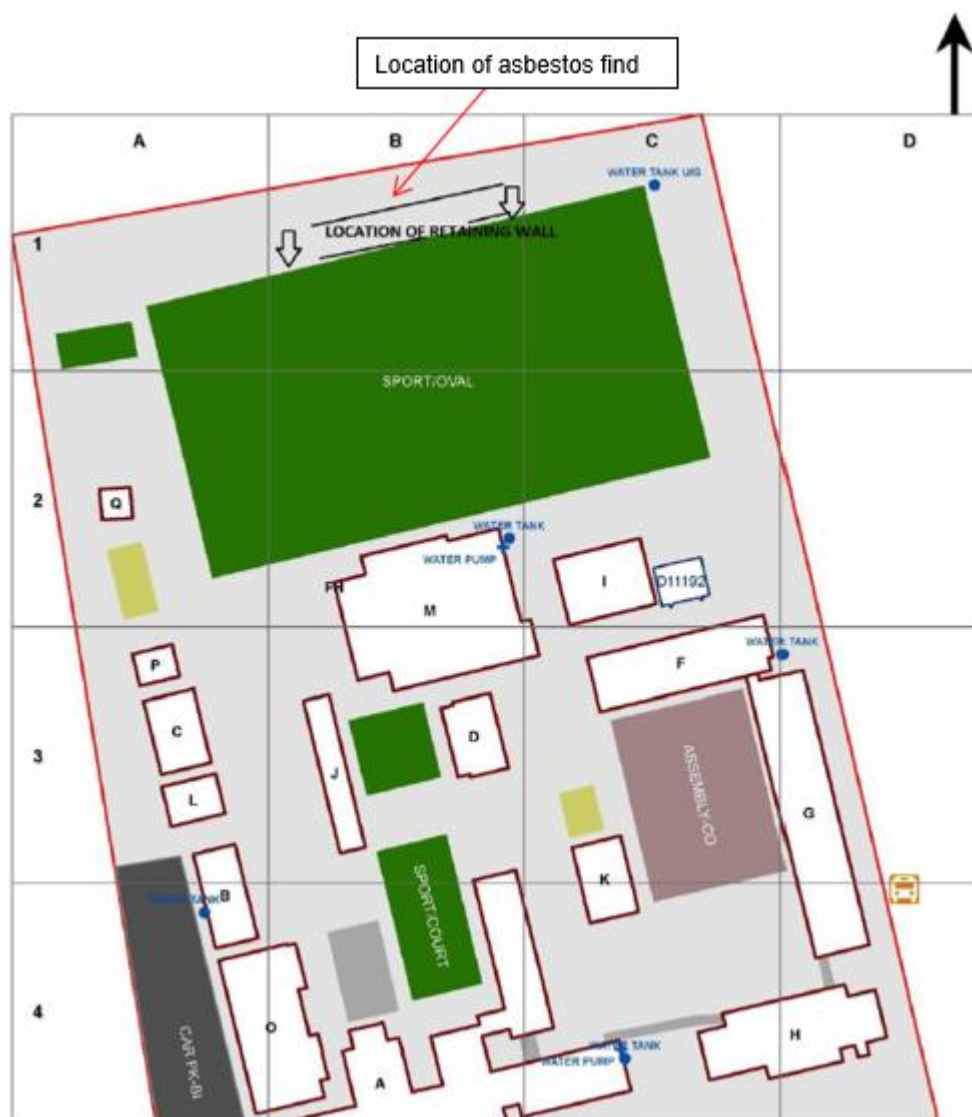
WSP (2019) Plan of Retaining Wall Where Asbestos Containing Materials Identified
